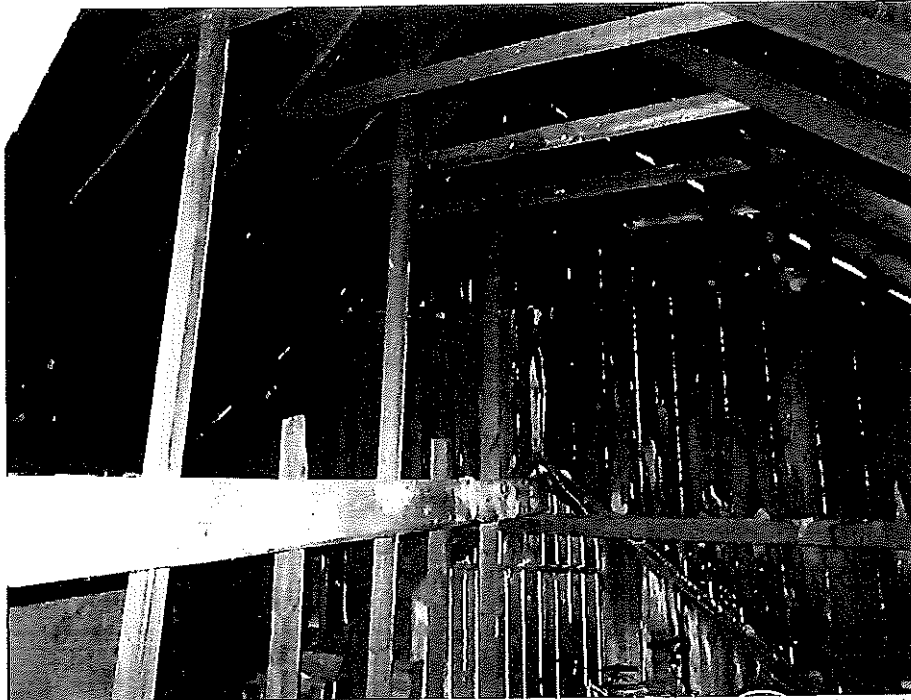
Roof framing showing rafters, collar ties, and additional framing elements
